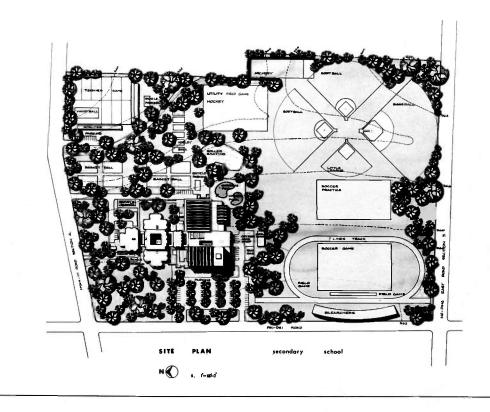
Plate XX illustrates the location of secondary school in Taipei City and the site plan.
